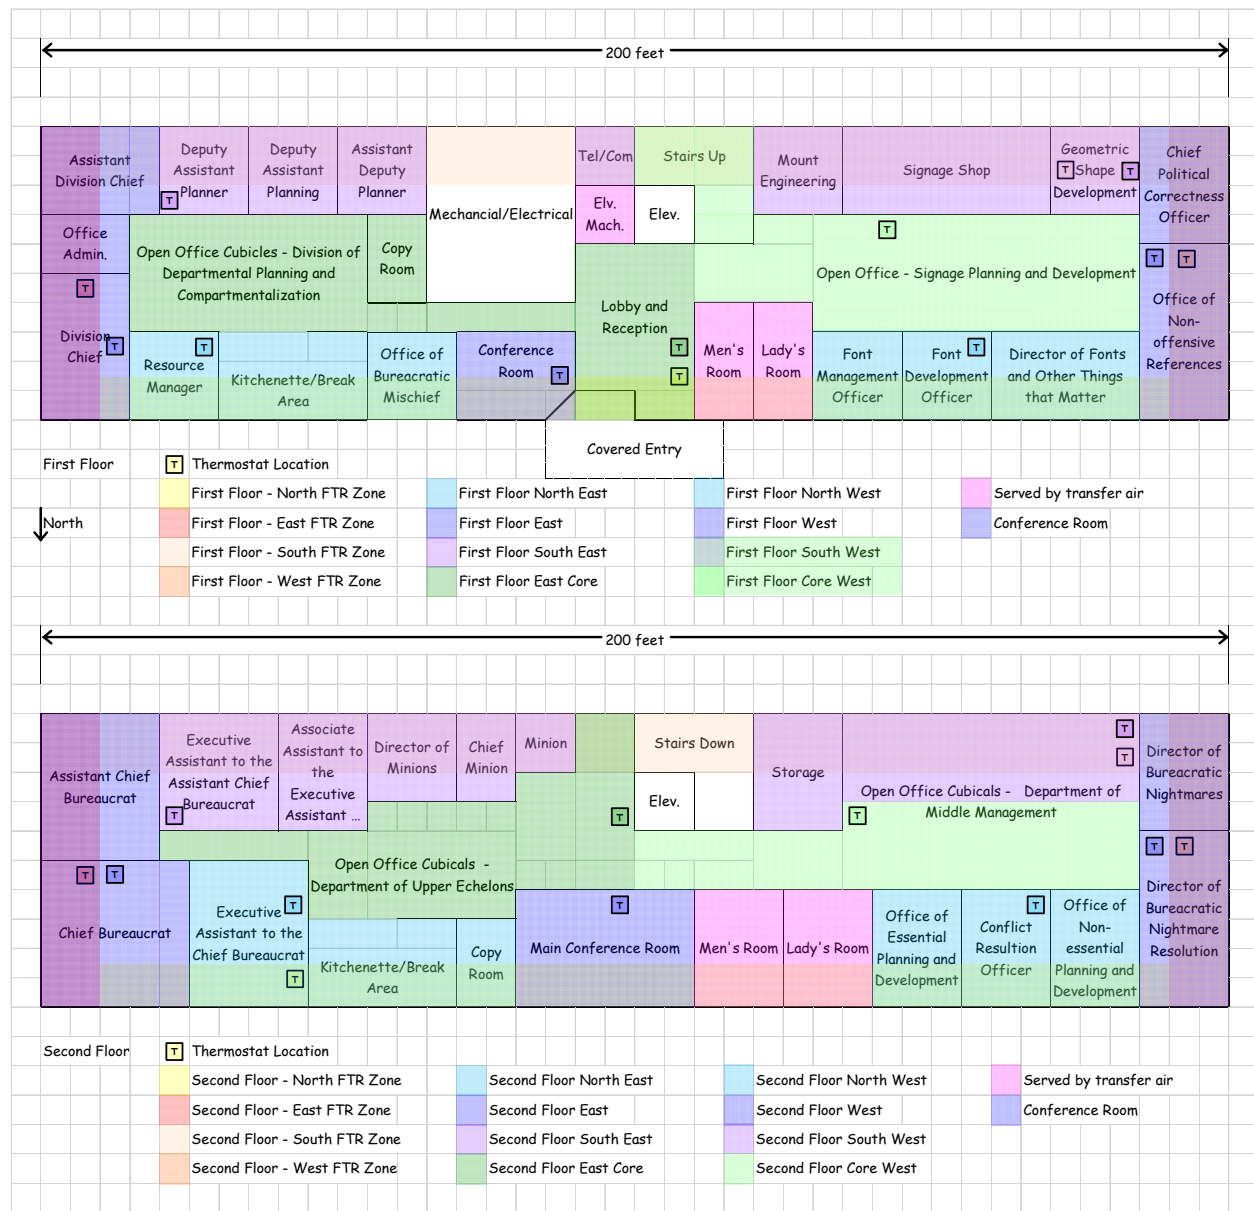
Bureaucratic Affairs Building Floor Plans with FTR Zones and VAV Zones
